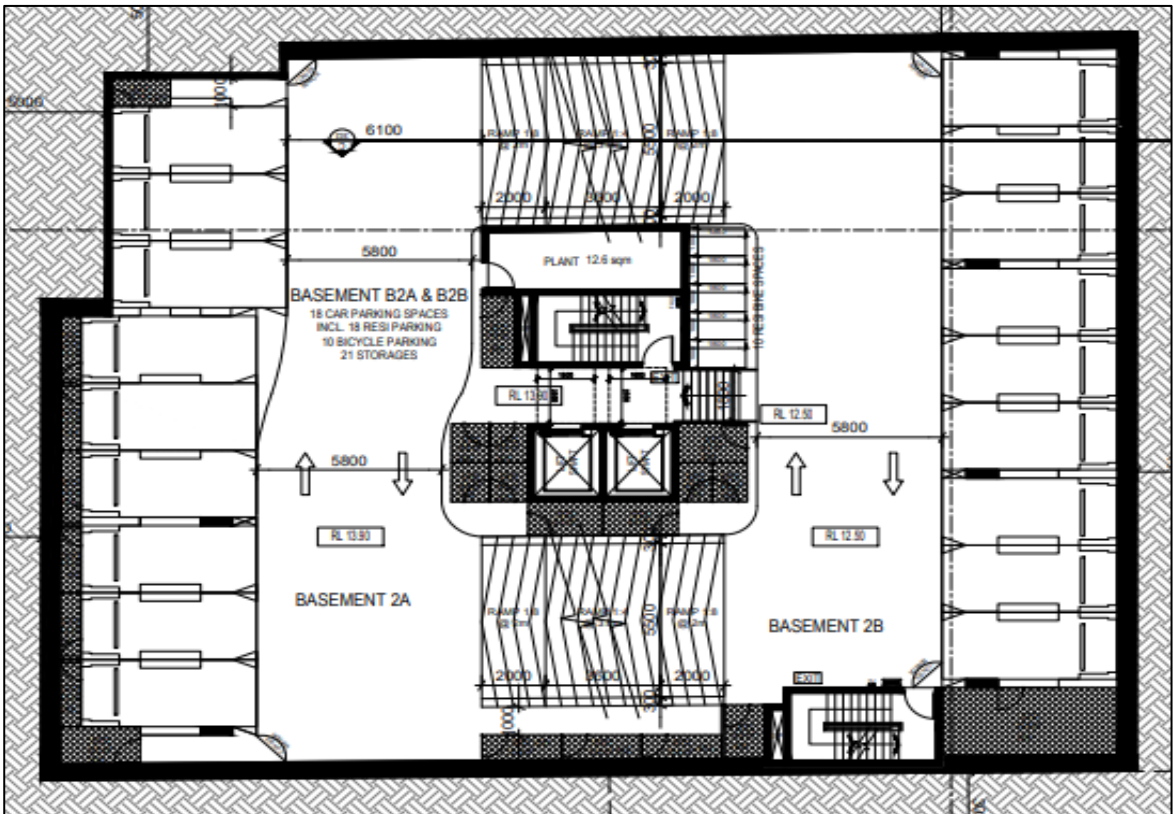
Extract of applicants submitted Basement Level 2 Plan.
